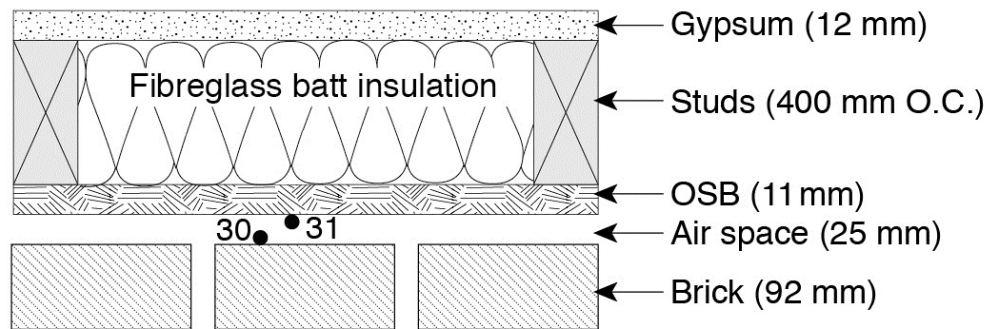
Layered wall structure for the CCHT house. Dots refer to sensor locations and numbers refer to sensor identity. Gypsum on top is on the interior side of the house and the exterior masonry was typical clay fired brick.
